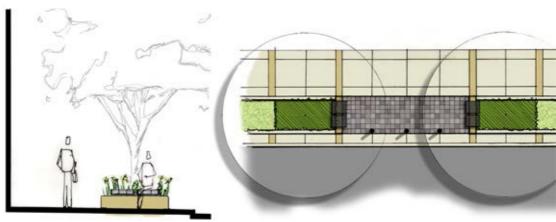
Streetscape Paving Concept. Source: Smith Group[]R
